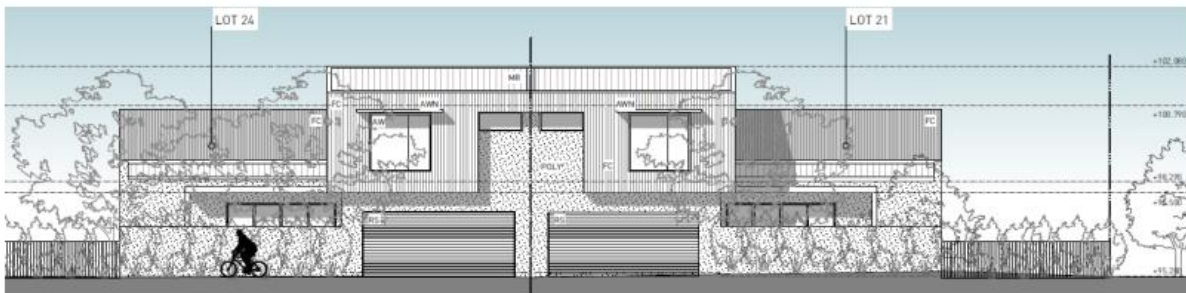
Kopa Street Elevation of Terrace Apartments on Lot 4
